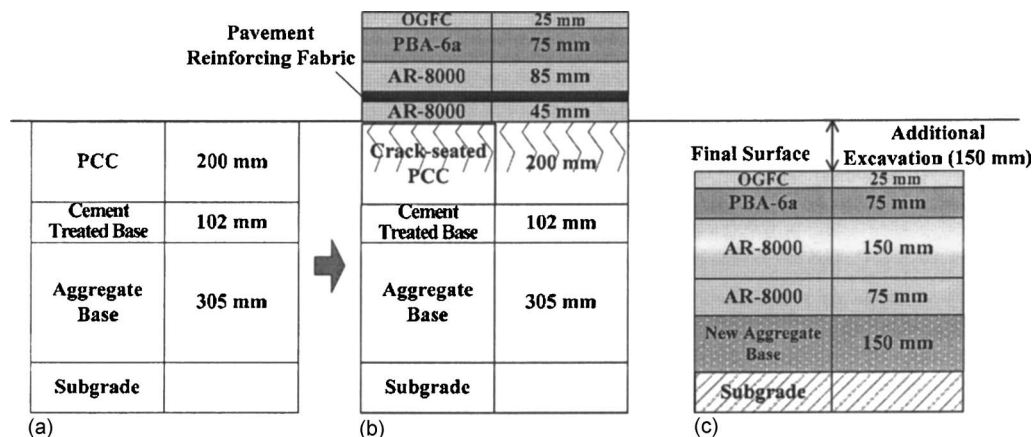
Typical pavement cross-section changes: (a) existing pavement; (b) CSOL [crack, seat, and AC overlay (230 mm)]; and (c) FDAC (full-depth AC replacement (325 mm))
